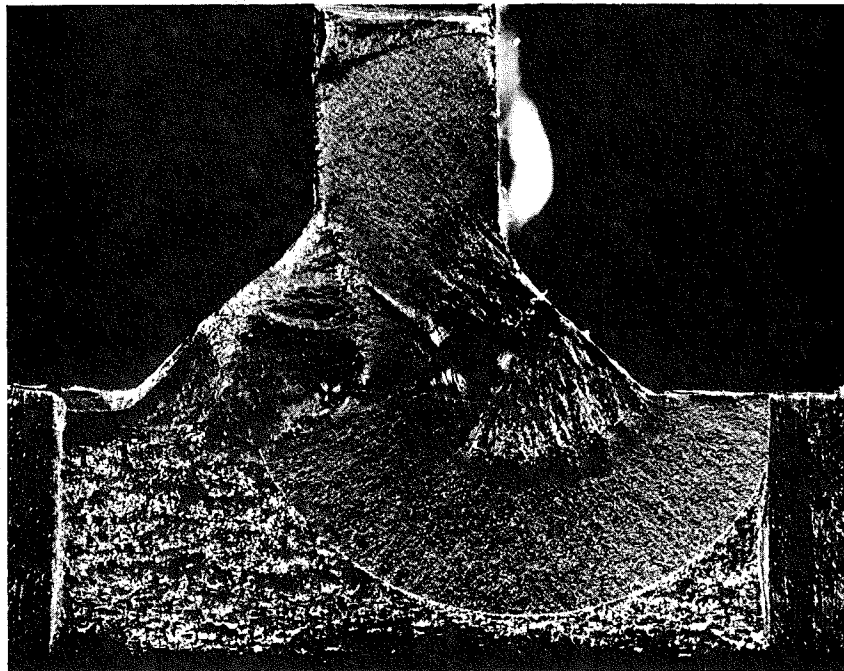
Crack in flange-to-web junction approaching the extreme fibre of the tension flange ( $x3.6$ )
